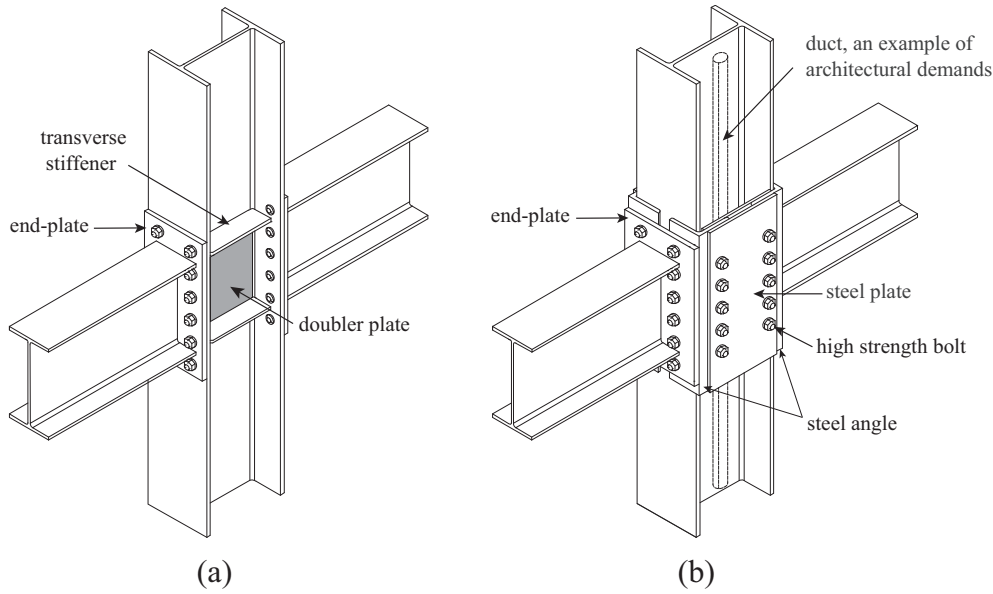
Beam-to-column connections: (a) typical bolted joint and (b) proposed bolted joint.
